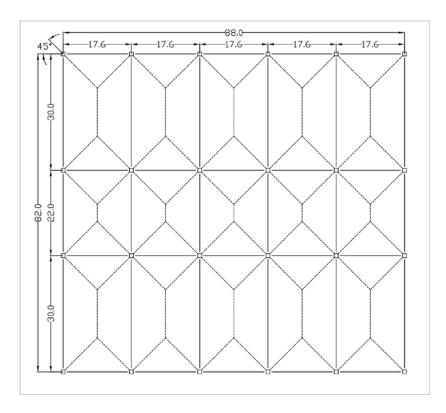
Tributary Area of Beams in Typical Floor Layout (ft)
